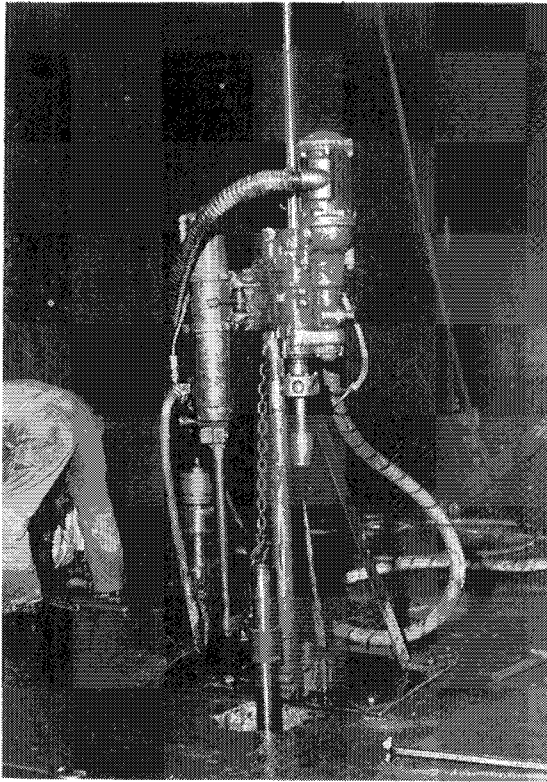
Typical Column-Mounted Rotary Drill Rig
